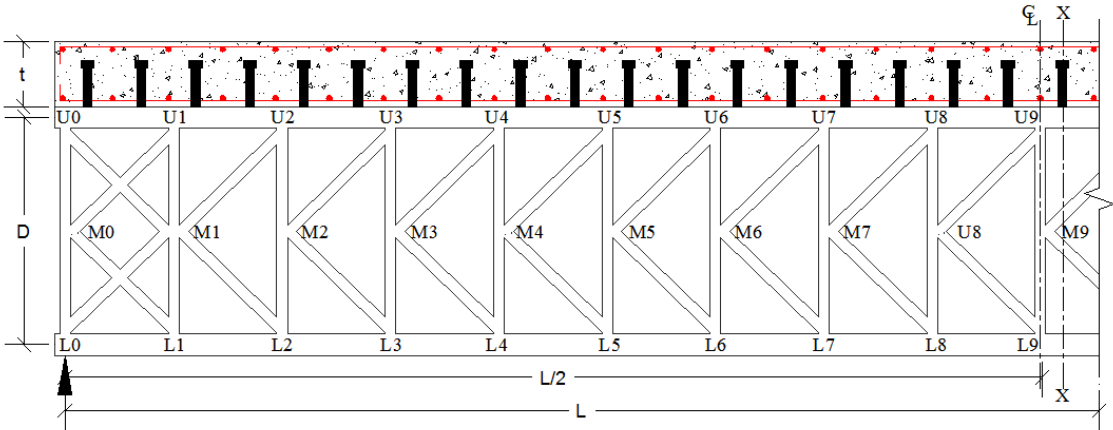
Composite truss bridge model for plastic failure
